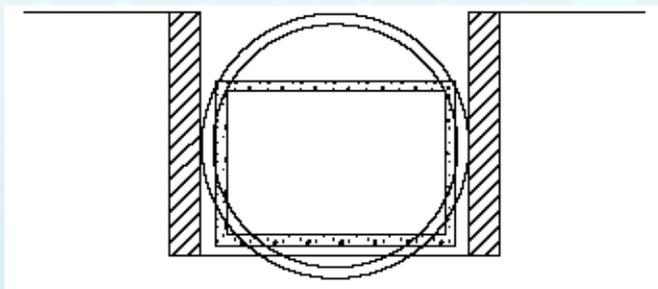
Small spatial requirement of box culvert than pipes.
